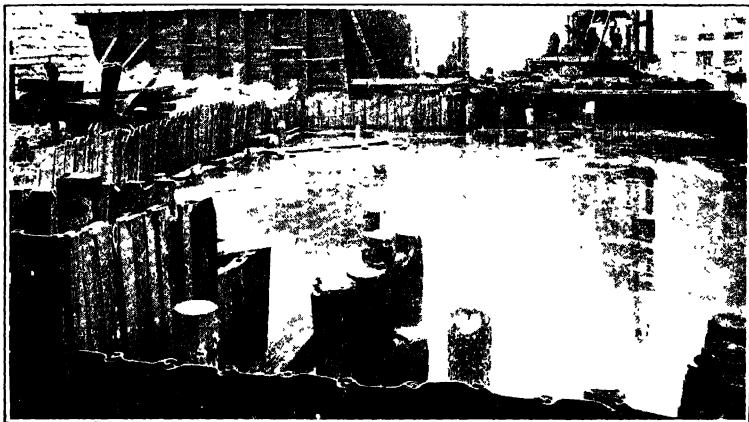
Cofferdam showing Lackawanna arch web piling for front and side walls—Wakefield piling for back wall.
